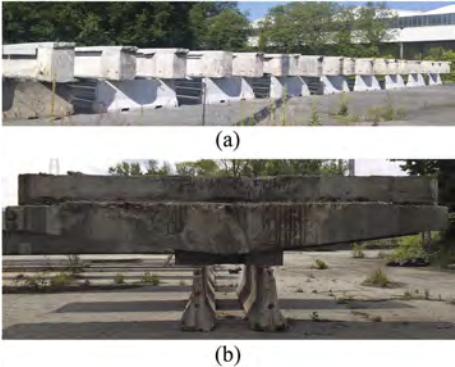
Bridge elements stored in the testing site: (a) deck beams; (b) pier cap (Biondini et al. 2020).
